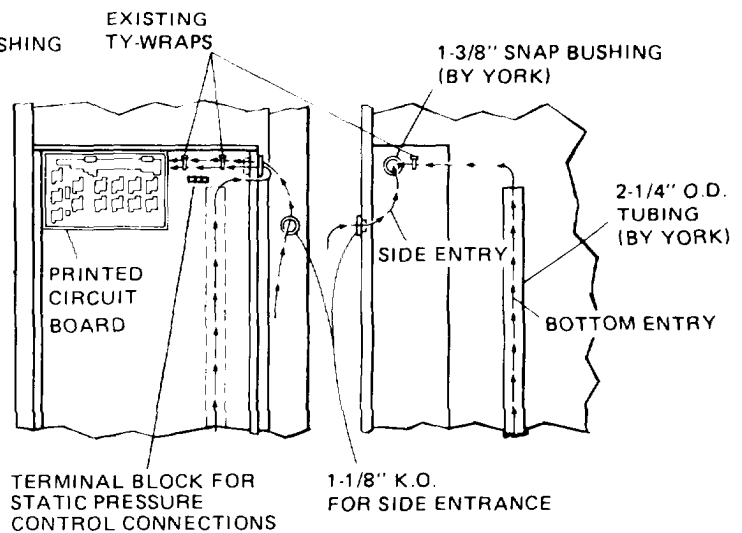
CONTROL WIRING ENTRANCE (DSV480)
